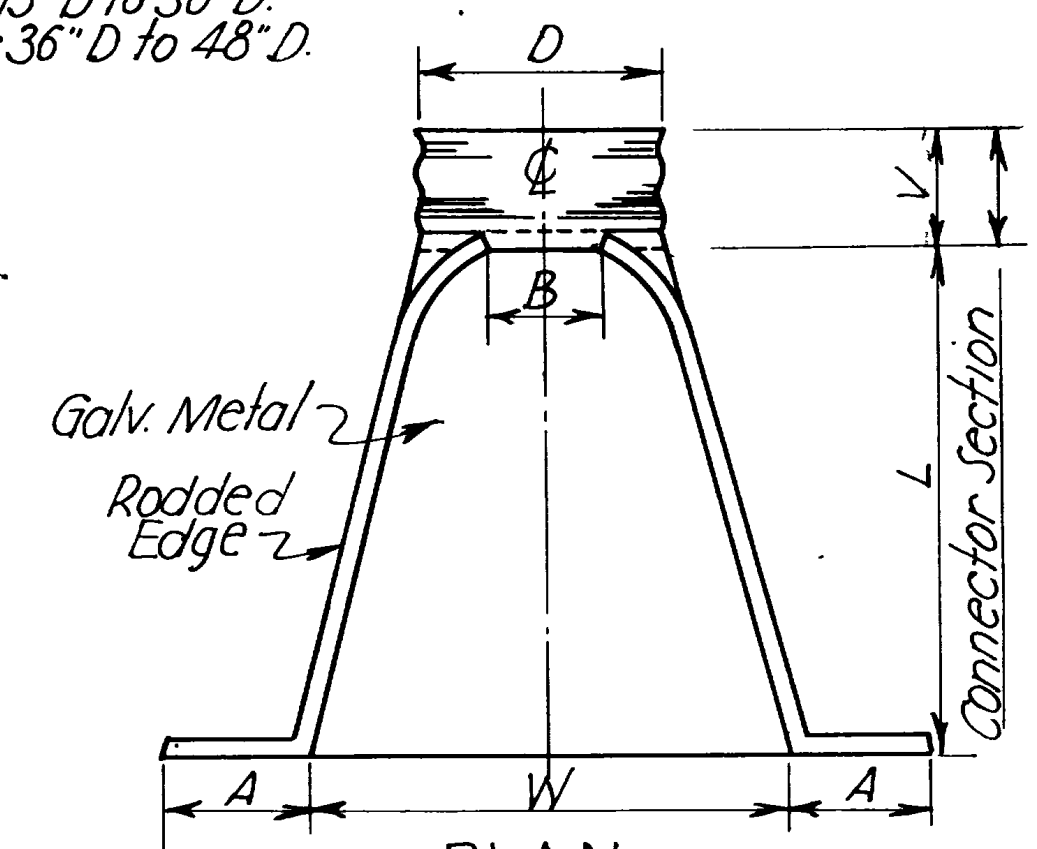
DETAIL OF END SECTION ANCHORED TO ADJACENT STRAIGHT SECTION
